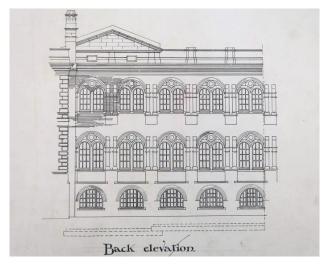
Back (western) elevation of Link Building (generally as constructed)
